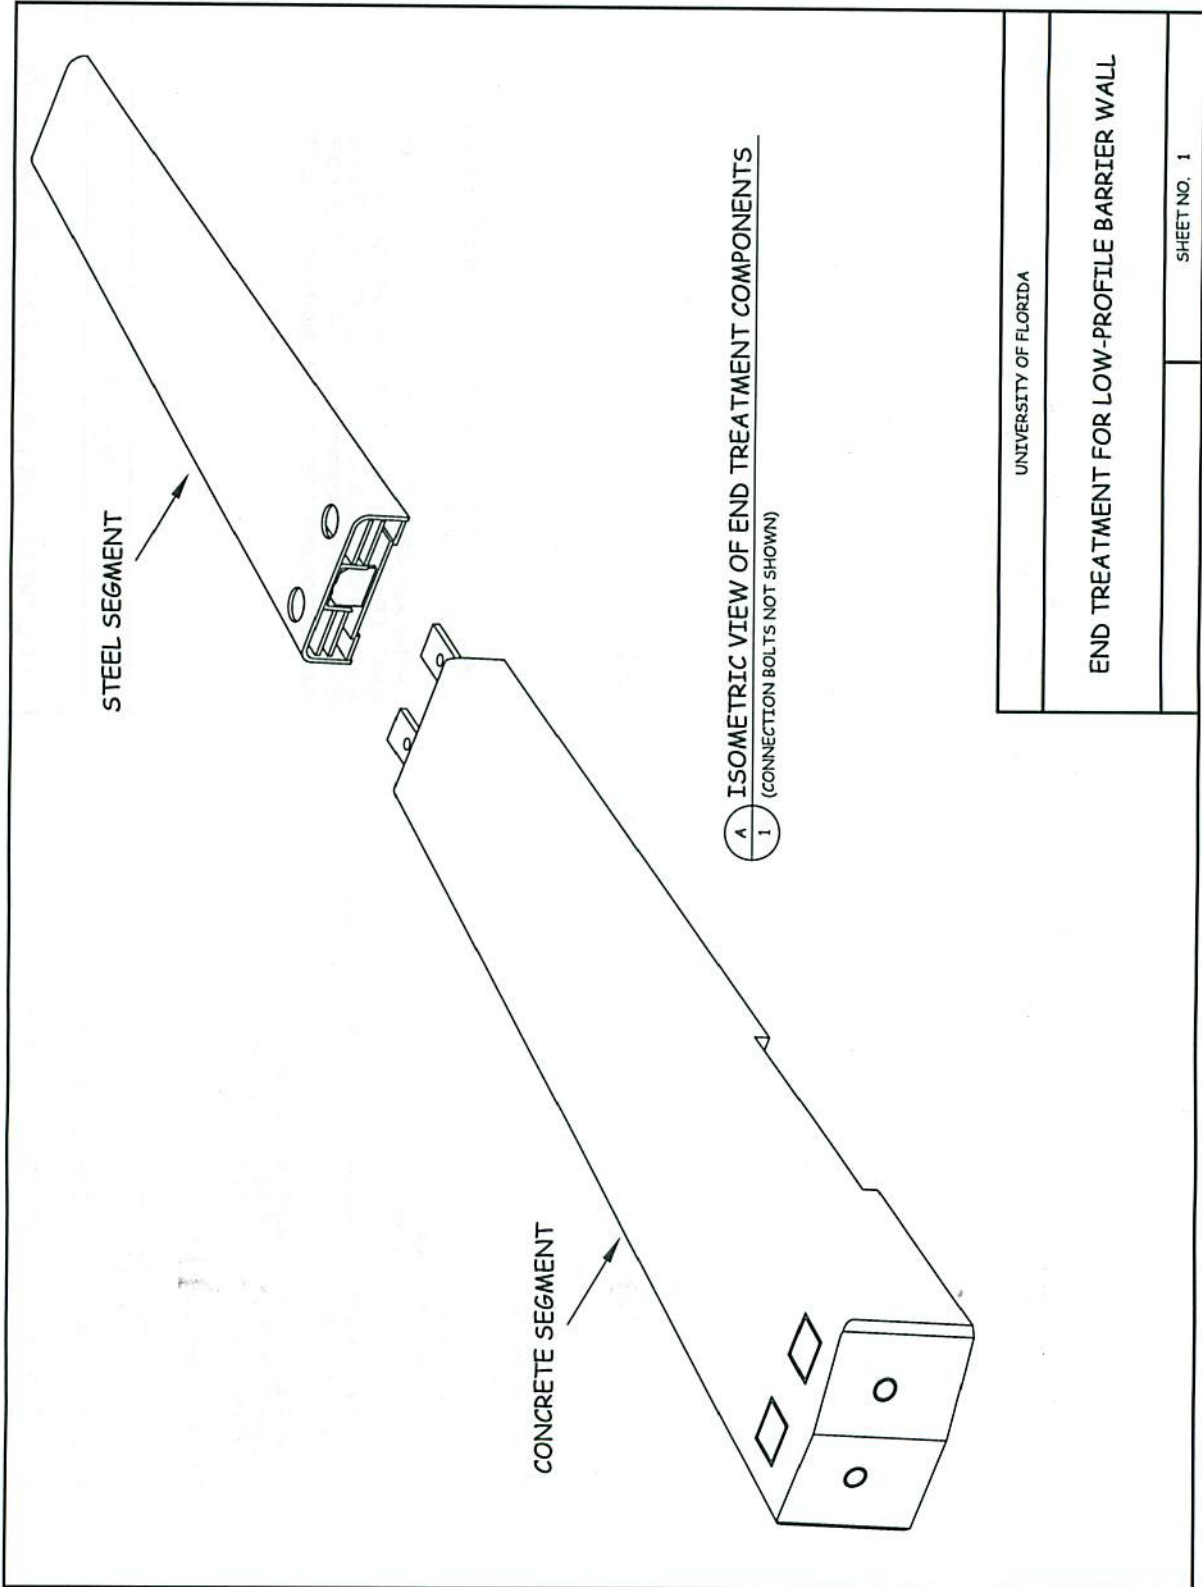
Drawings of Florida Concrete Curb End Treatment (4 of 14)
